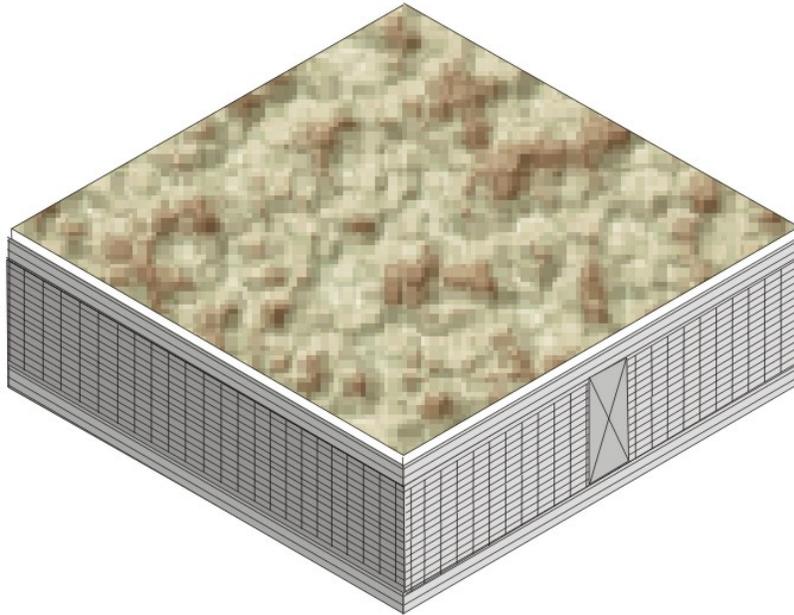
~~ – Wood Foam Panel (SIP) Floor
